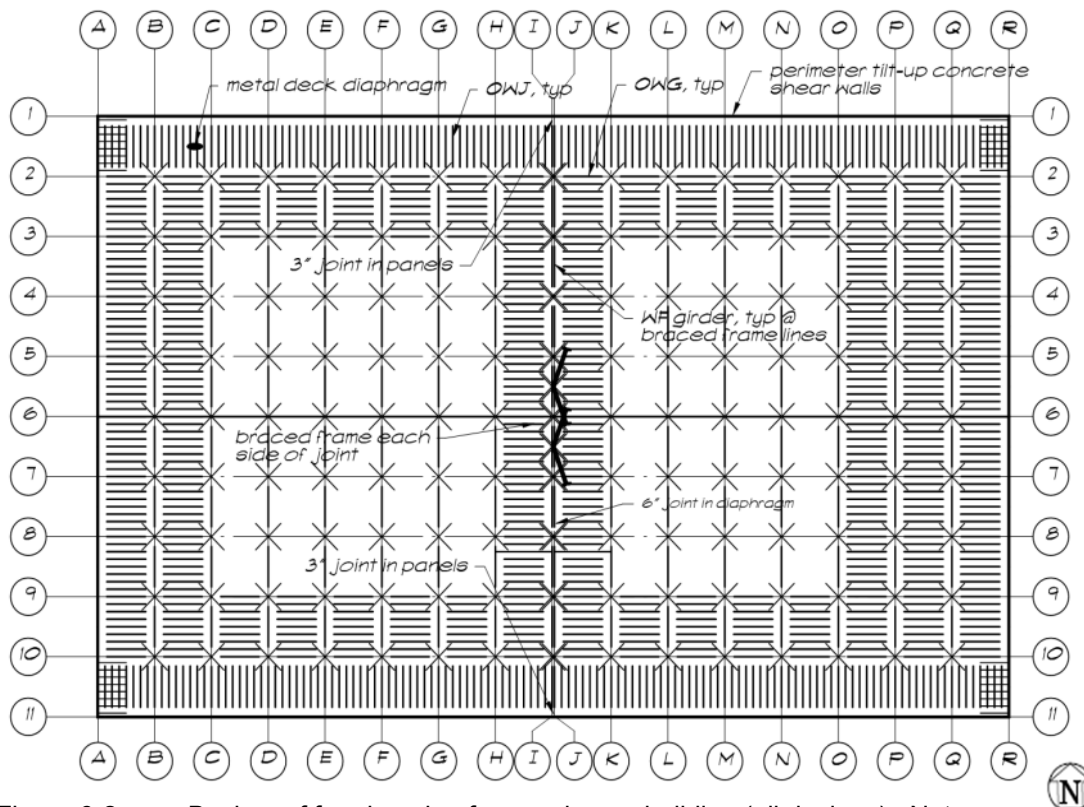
Basic roof framing plan for warehouse building (all designs). Note that joists are omitted in central area to make notes visible.
